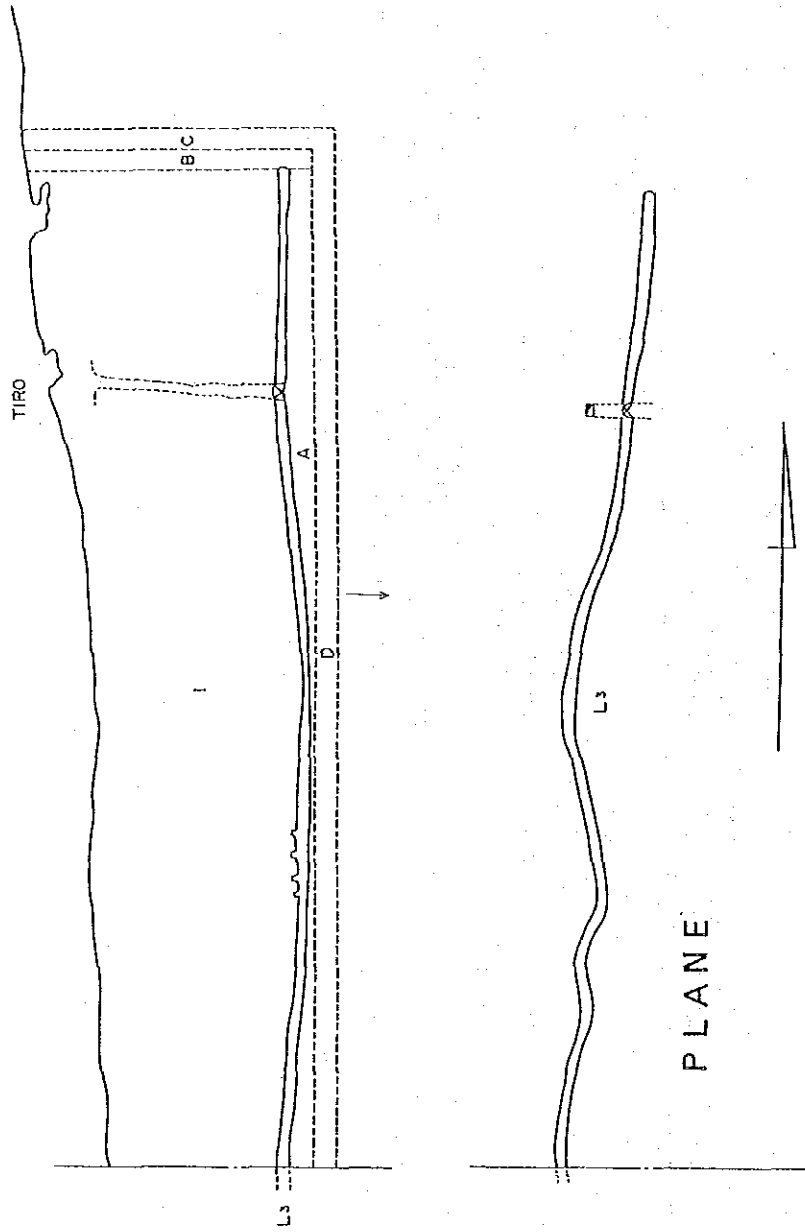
La Presa -Plane and Longitudinal Section-
